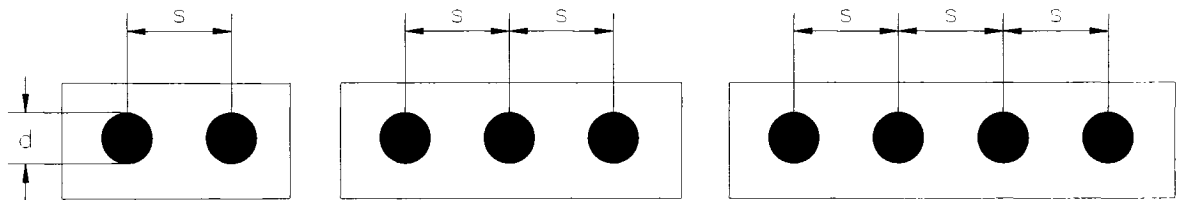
Plan of 1x2, 1x3 & 1x4 pile group
